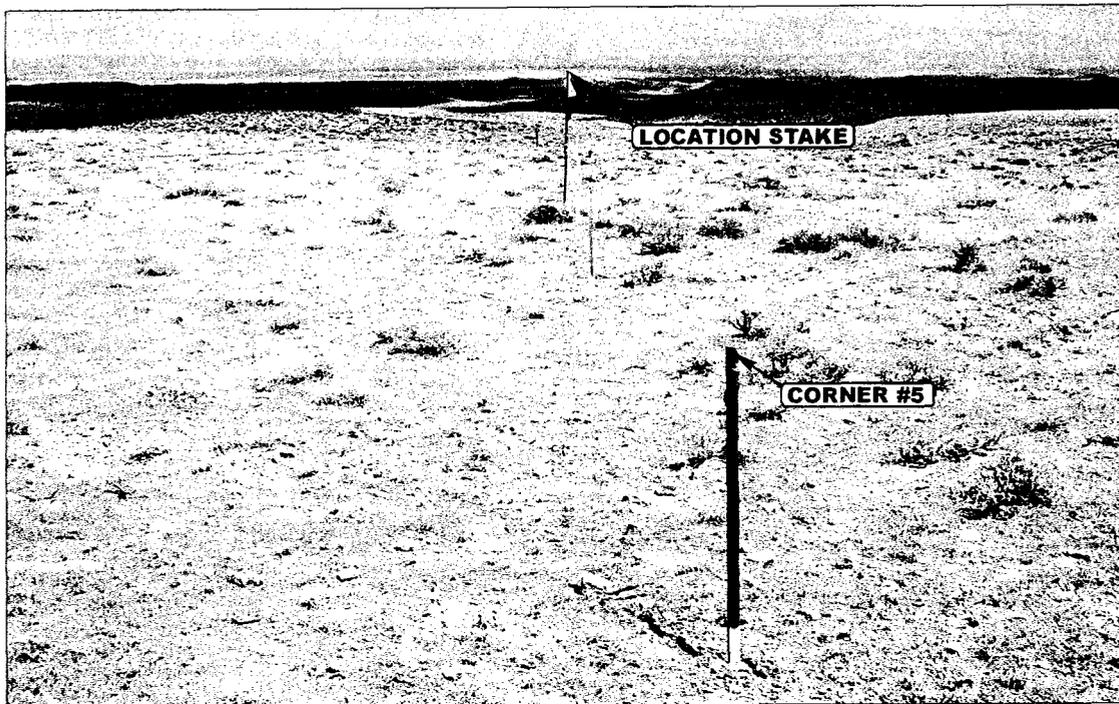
PHOTO: VIEW FROM CORNER #5 TO LOCATION STAKE
